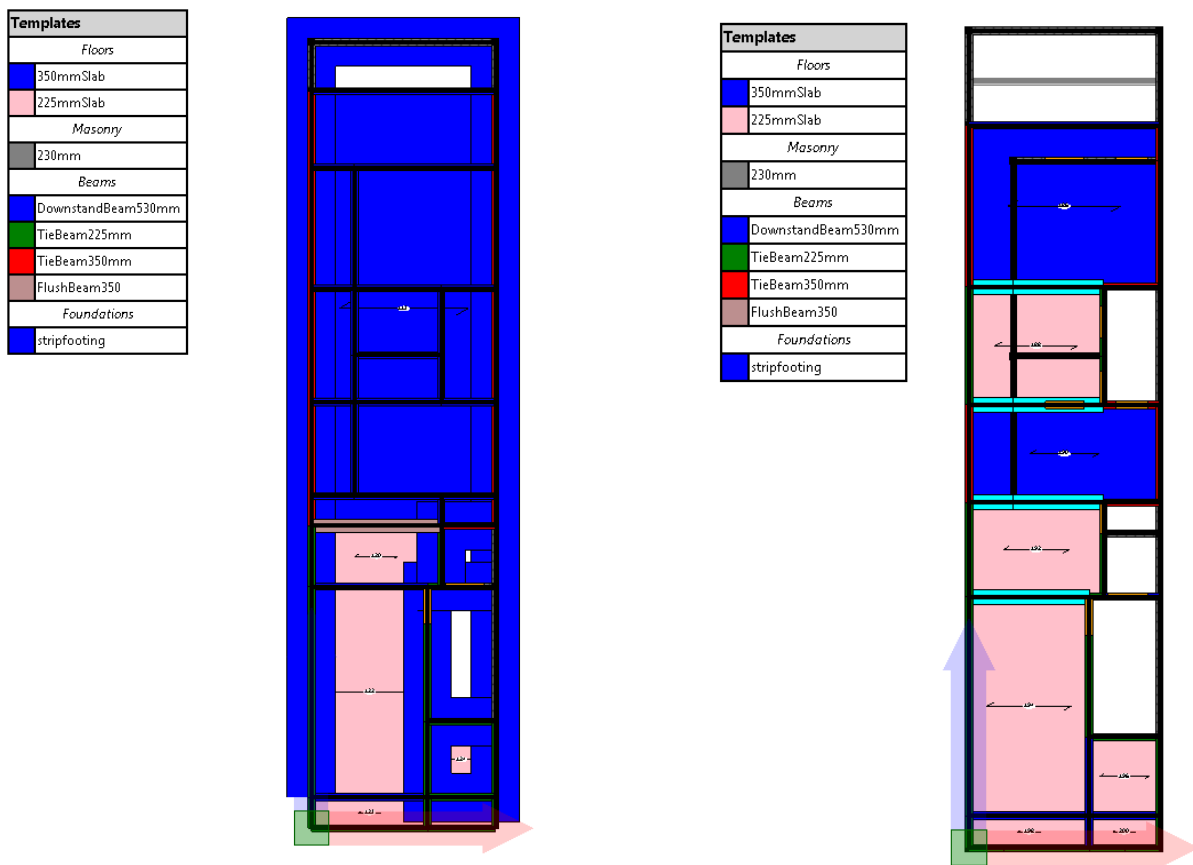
Typical layout plan (left) basement level (right) all upper floors
